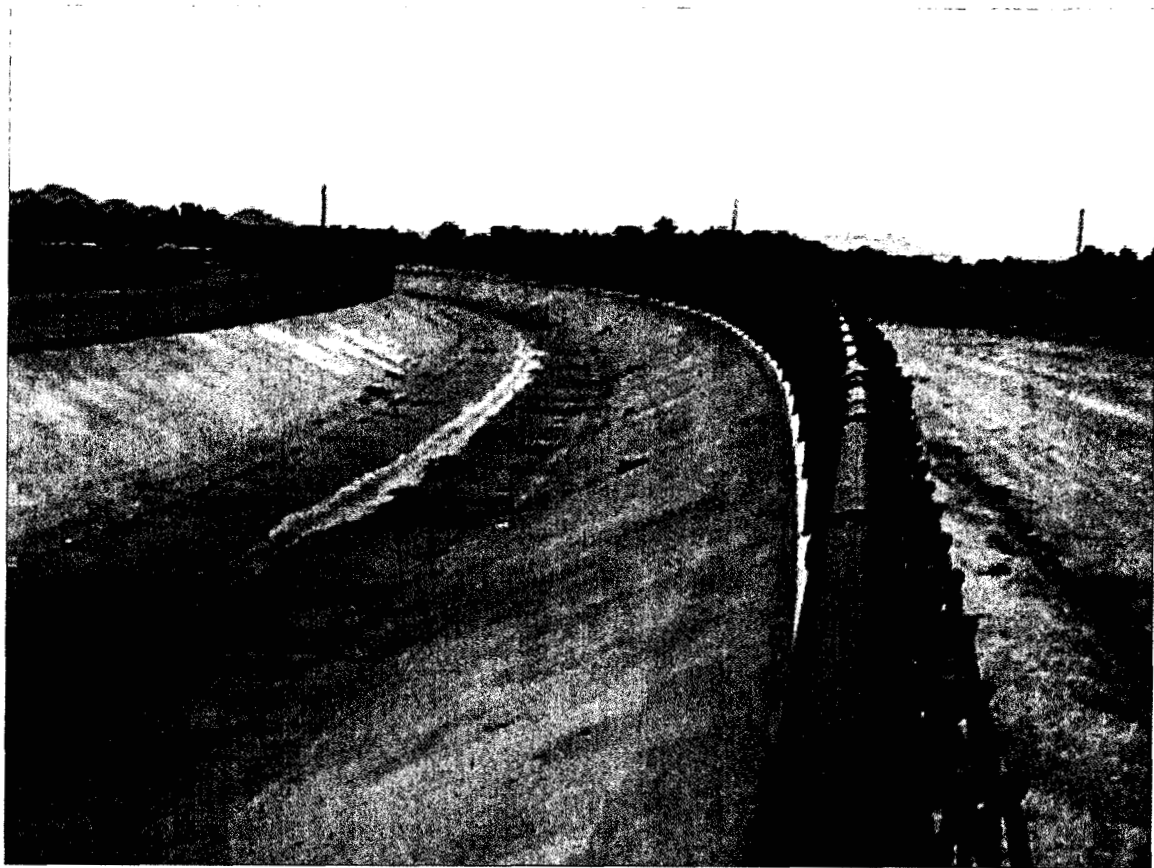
Gowan Outfall at the upstream limit of the study looking downstream.
